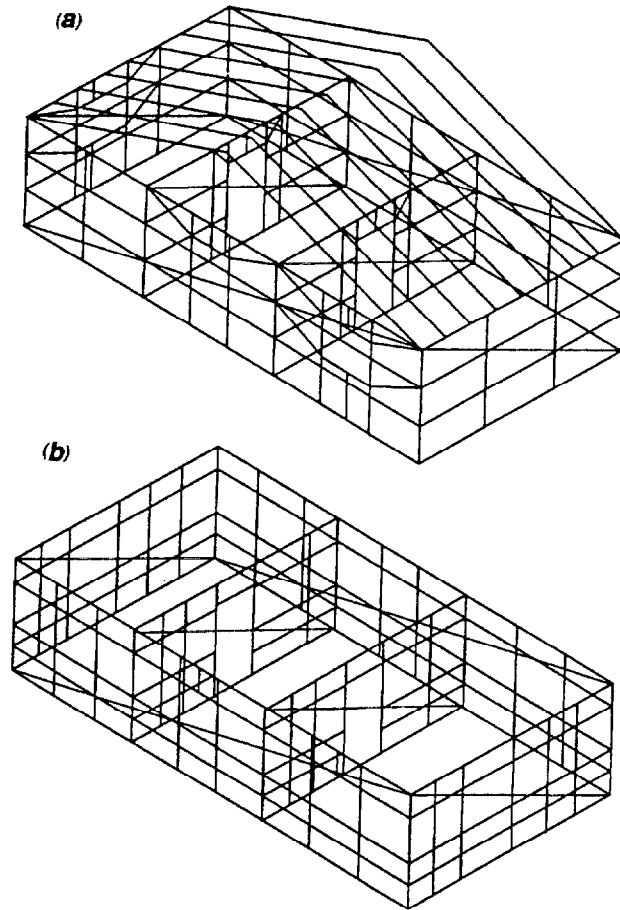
Finite Element Model of the Philips House (after Kasal and Leichti, 1992a)
